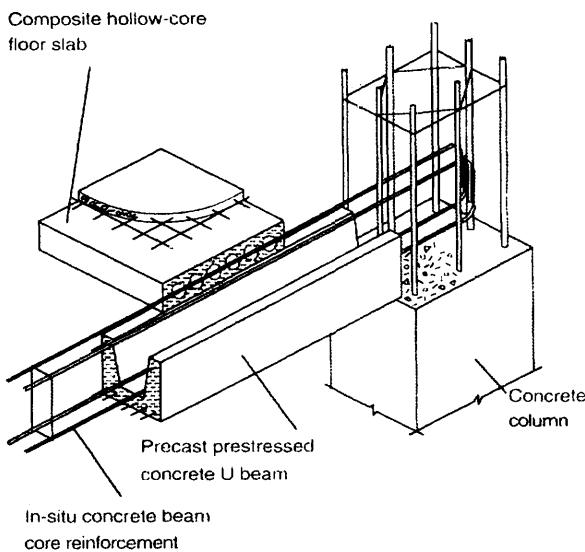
Precast shell beams with cast in situ concrete cores. (Courtesy of Prestressed Concrete Institute, USA)
